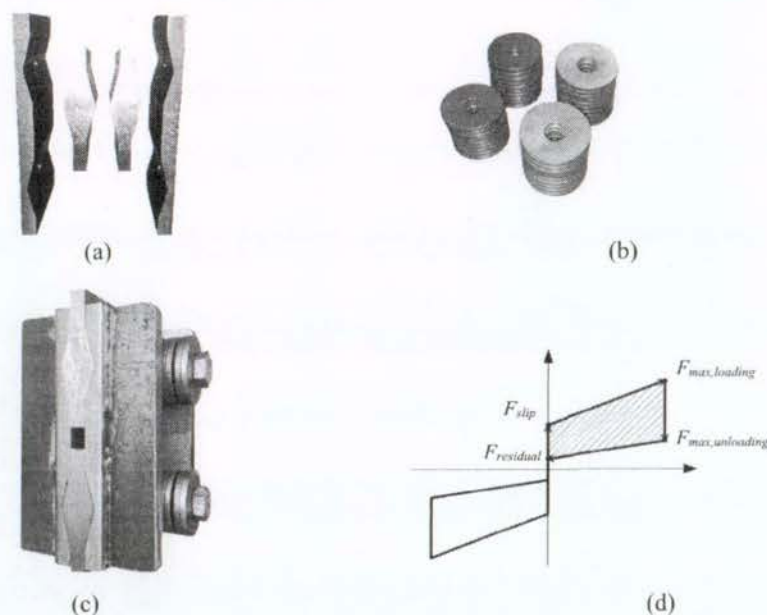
RSF joint: (a) Cap plates (before attaching the stiffeners) and centre slotted plates (b) Belleville springs (c) Assembly (d) Theoretical hysteresis.
